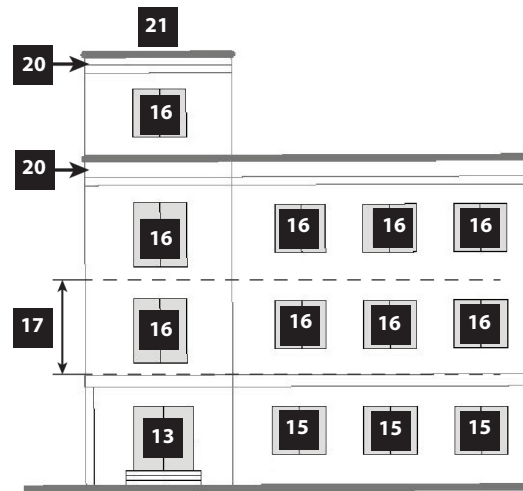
General building street facade diagram shown with corner tower, stoop entry type, and parapet roof type. Not to scale.
